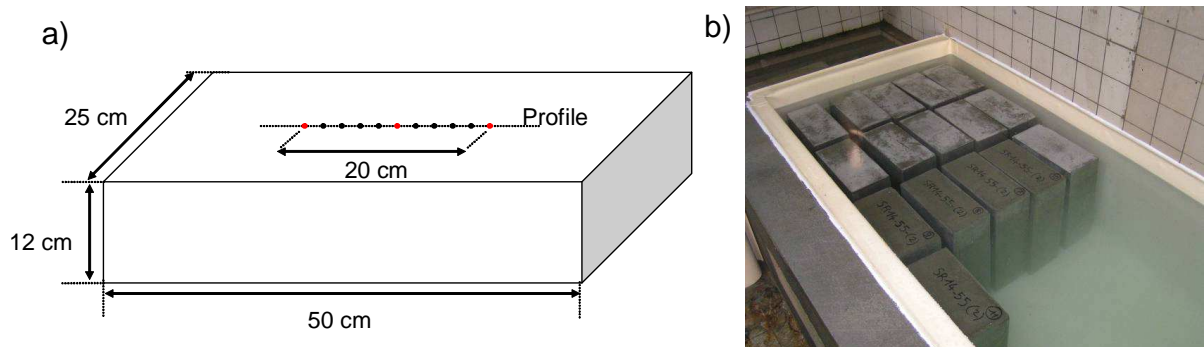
The tested concrete beams: a) the beam size and location of the measurement profile, b) the beams subjected to total saturation by fresh water.
